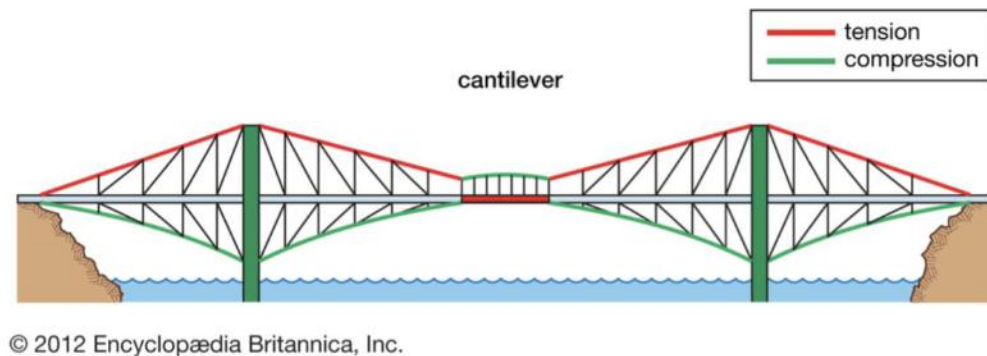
Example of a cantilever bridge (Cantilever, 2017)
